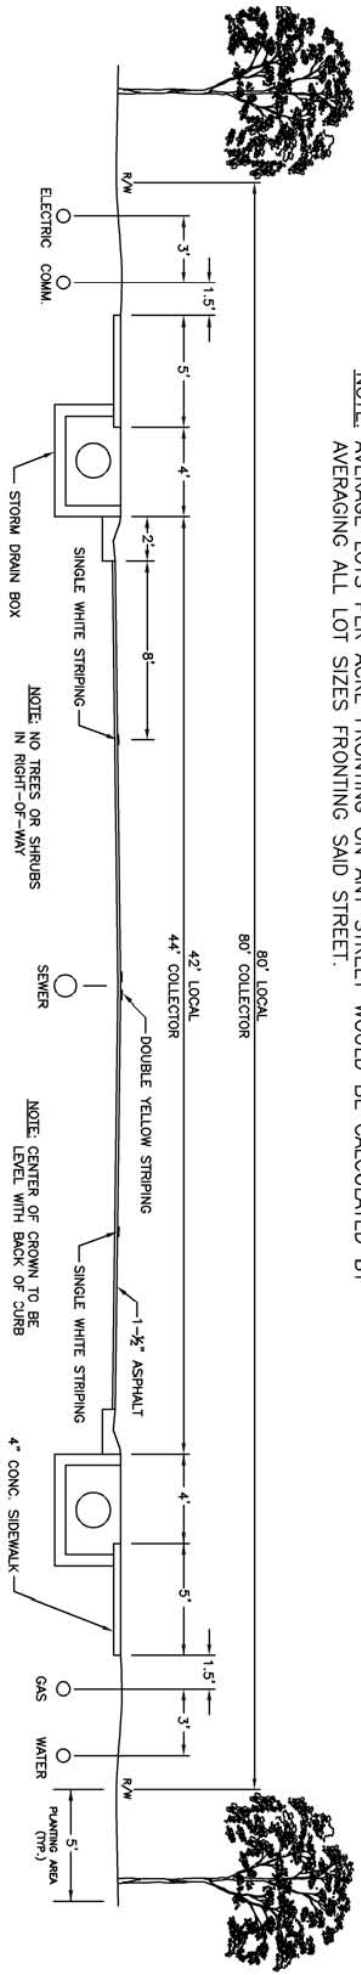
(K) Residential Street Cross Sections with Curb and Gutter
